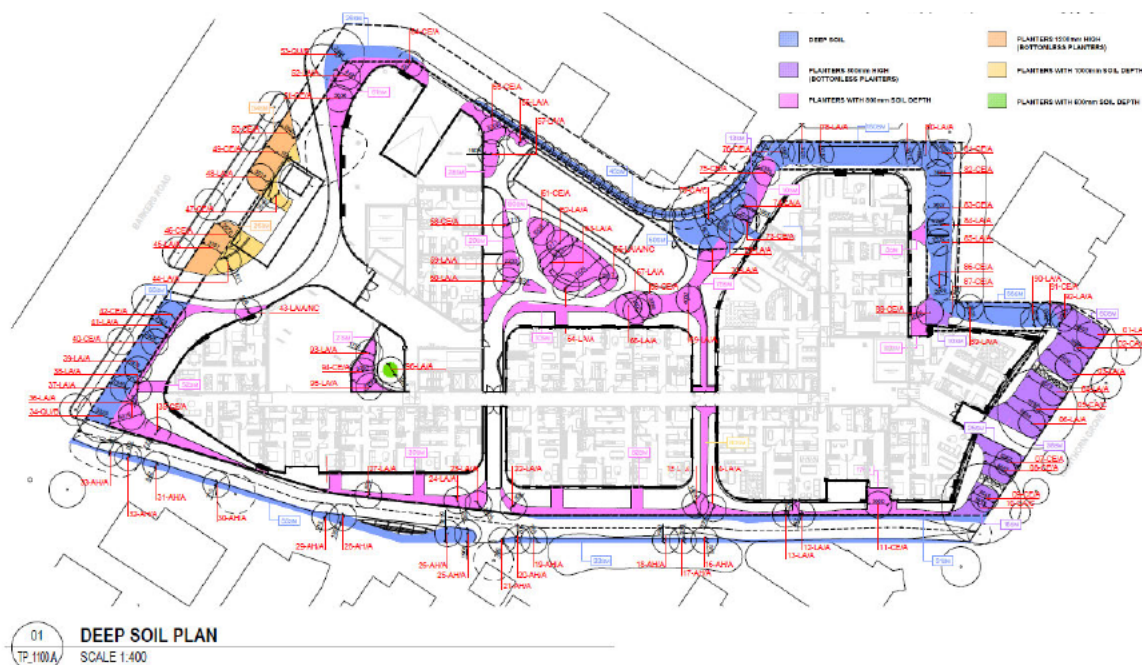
Deep soil plan of the site showing areas of bottomless soil (purple and orange areas) and planting above basement that is still at least 800mm deep and appropriate for Type A tree planting (pink)
